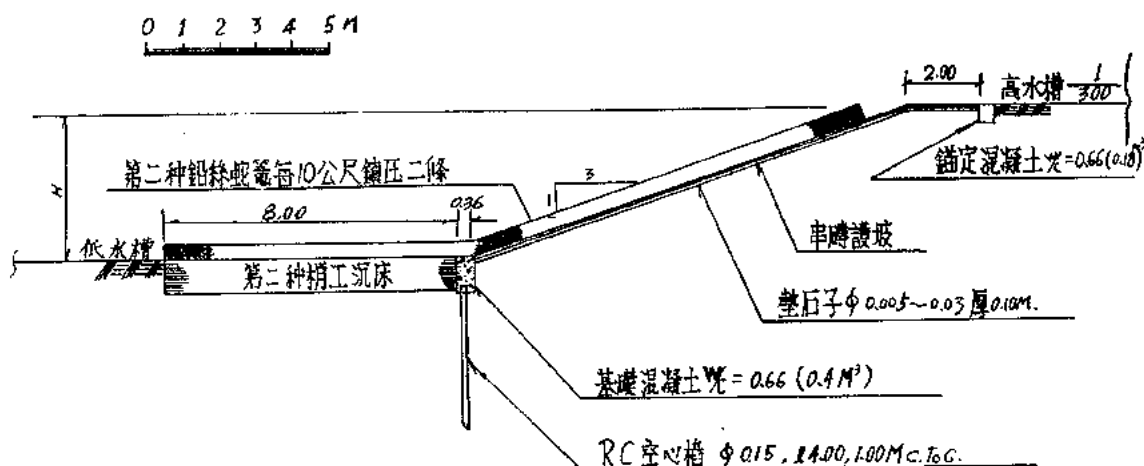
TYPICAL SECTION OF RIPRAP TOE PROTECTION
